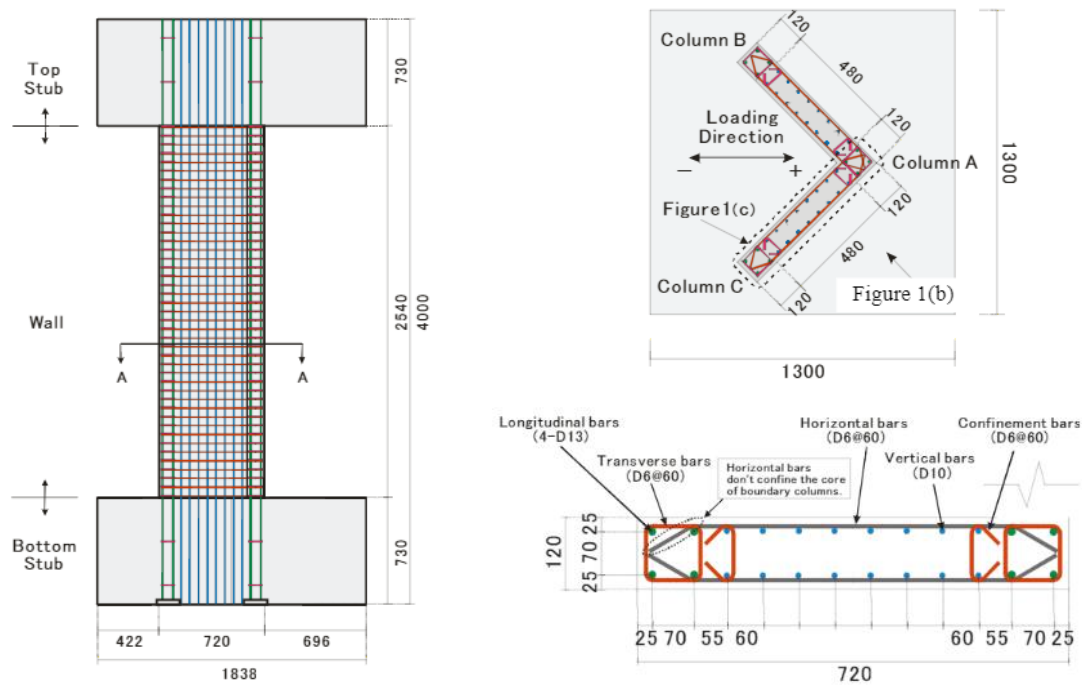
Test Specimen Reinforcement Details for Kono [107]
